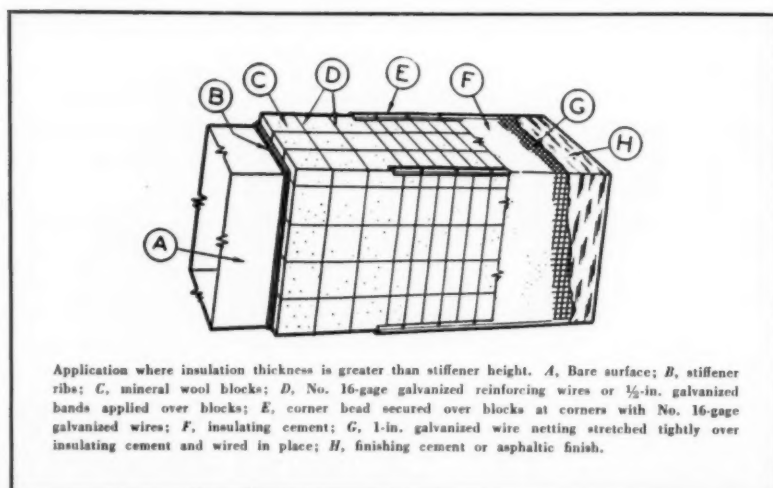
Application of mineral wool blocks on flat or rectangular surfaces.
